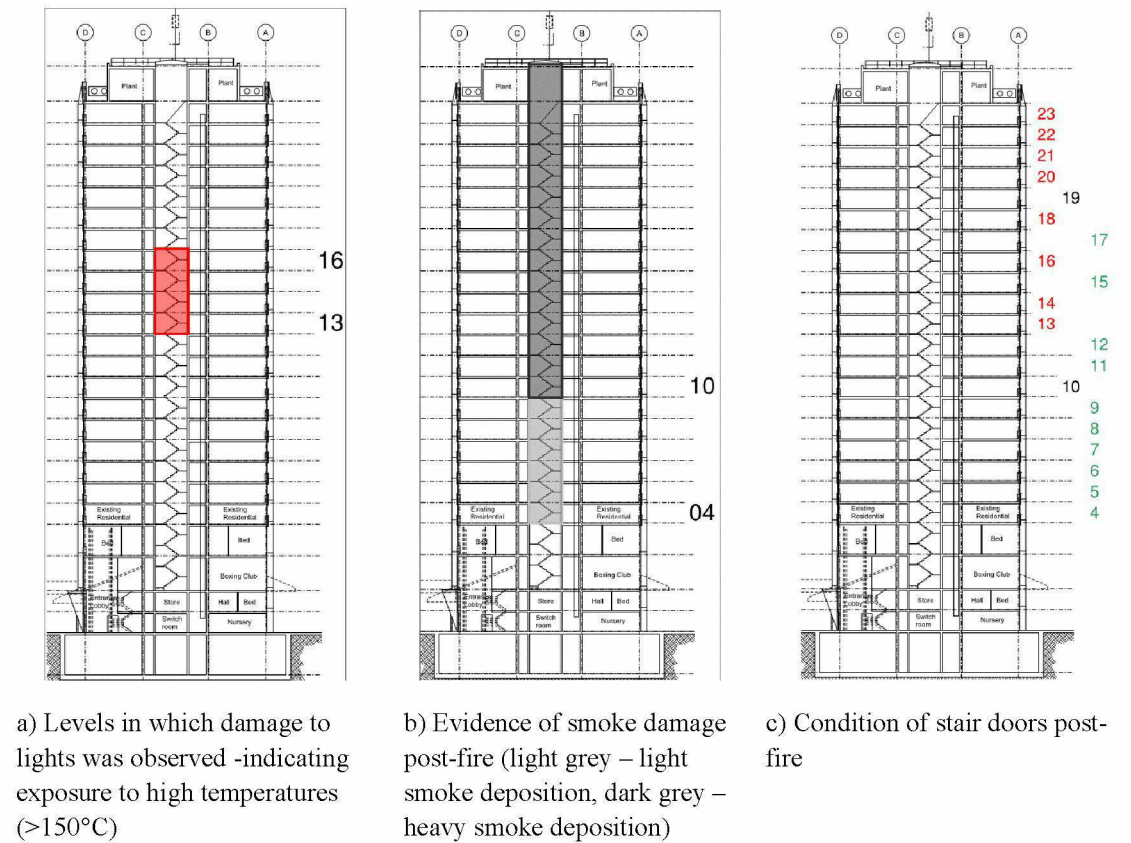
Damage observed in stairs (SEA00009461)
